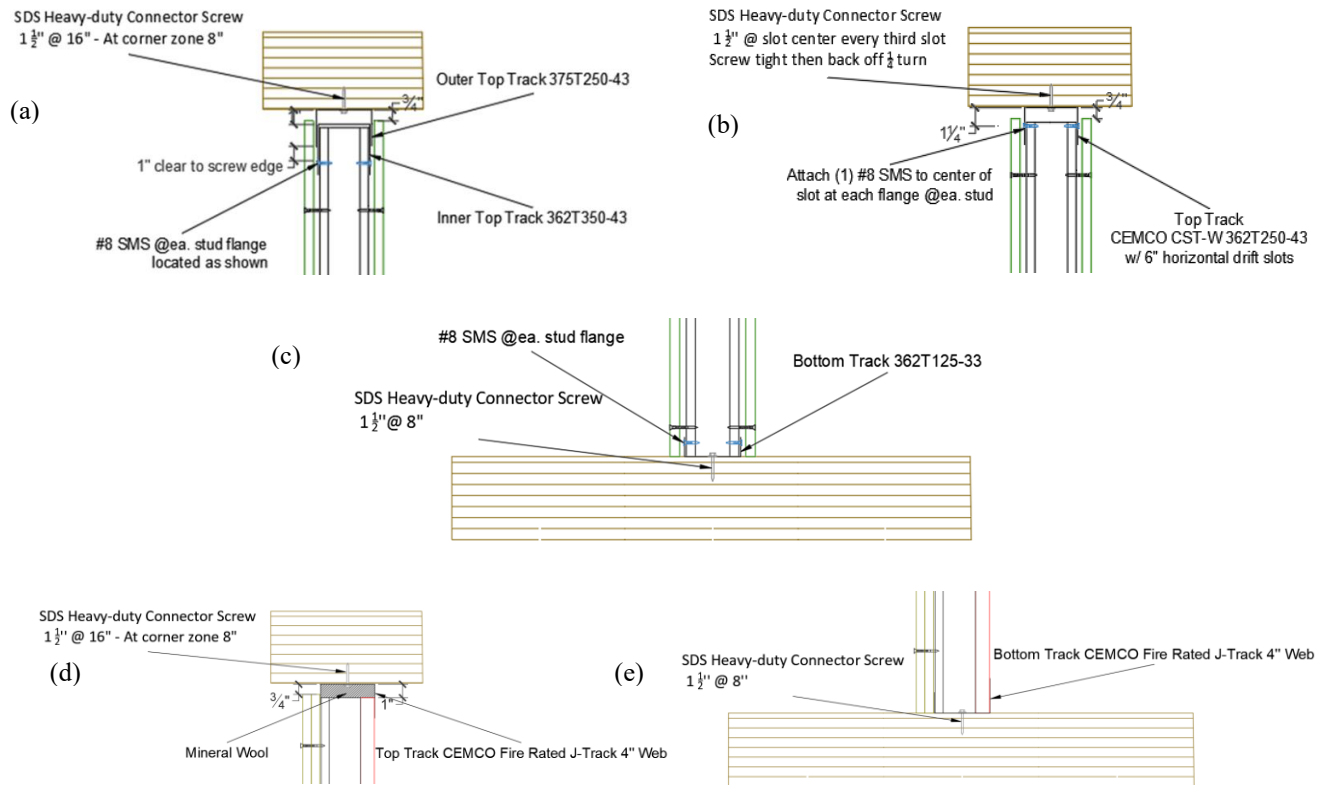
Section view of walls: a) double slip top of wall, b) slotted slip top of wall, c) conventional wall bottom of wall, d) shaft wall top of wall, and e) shaft wall bottom of wall.
